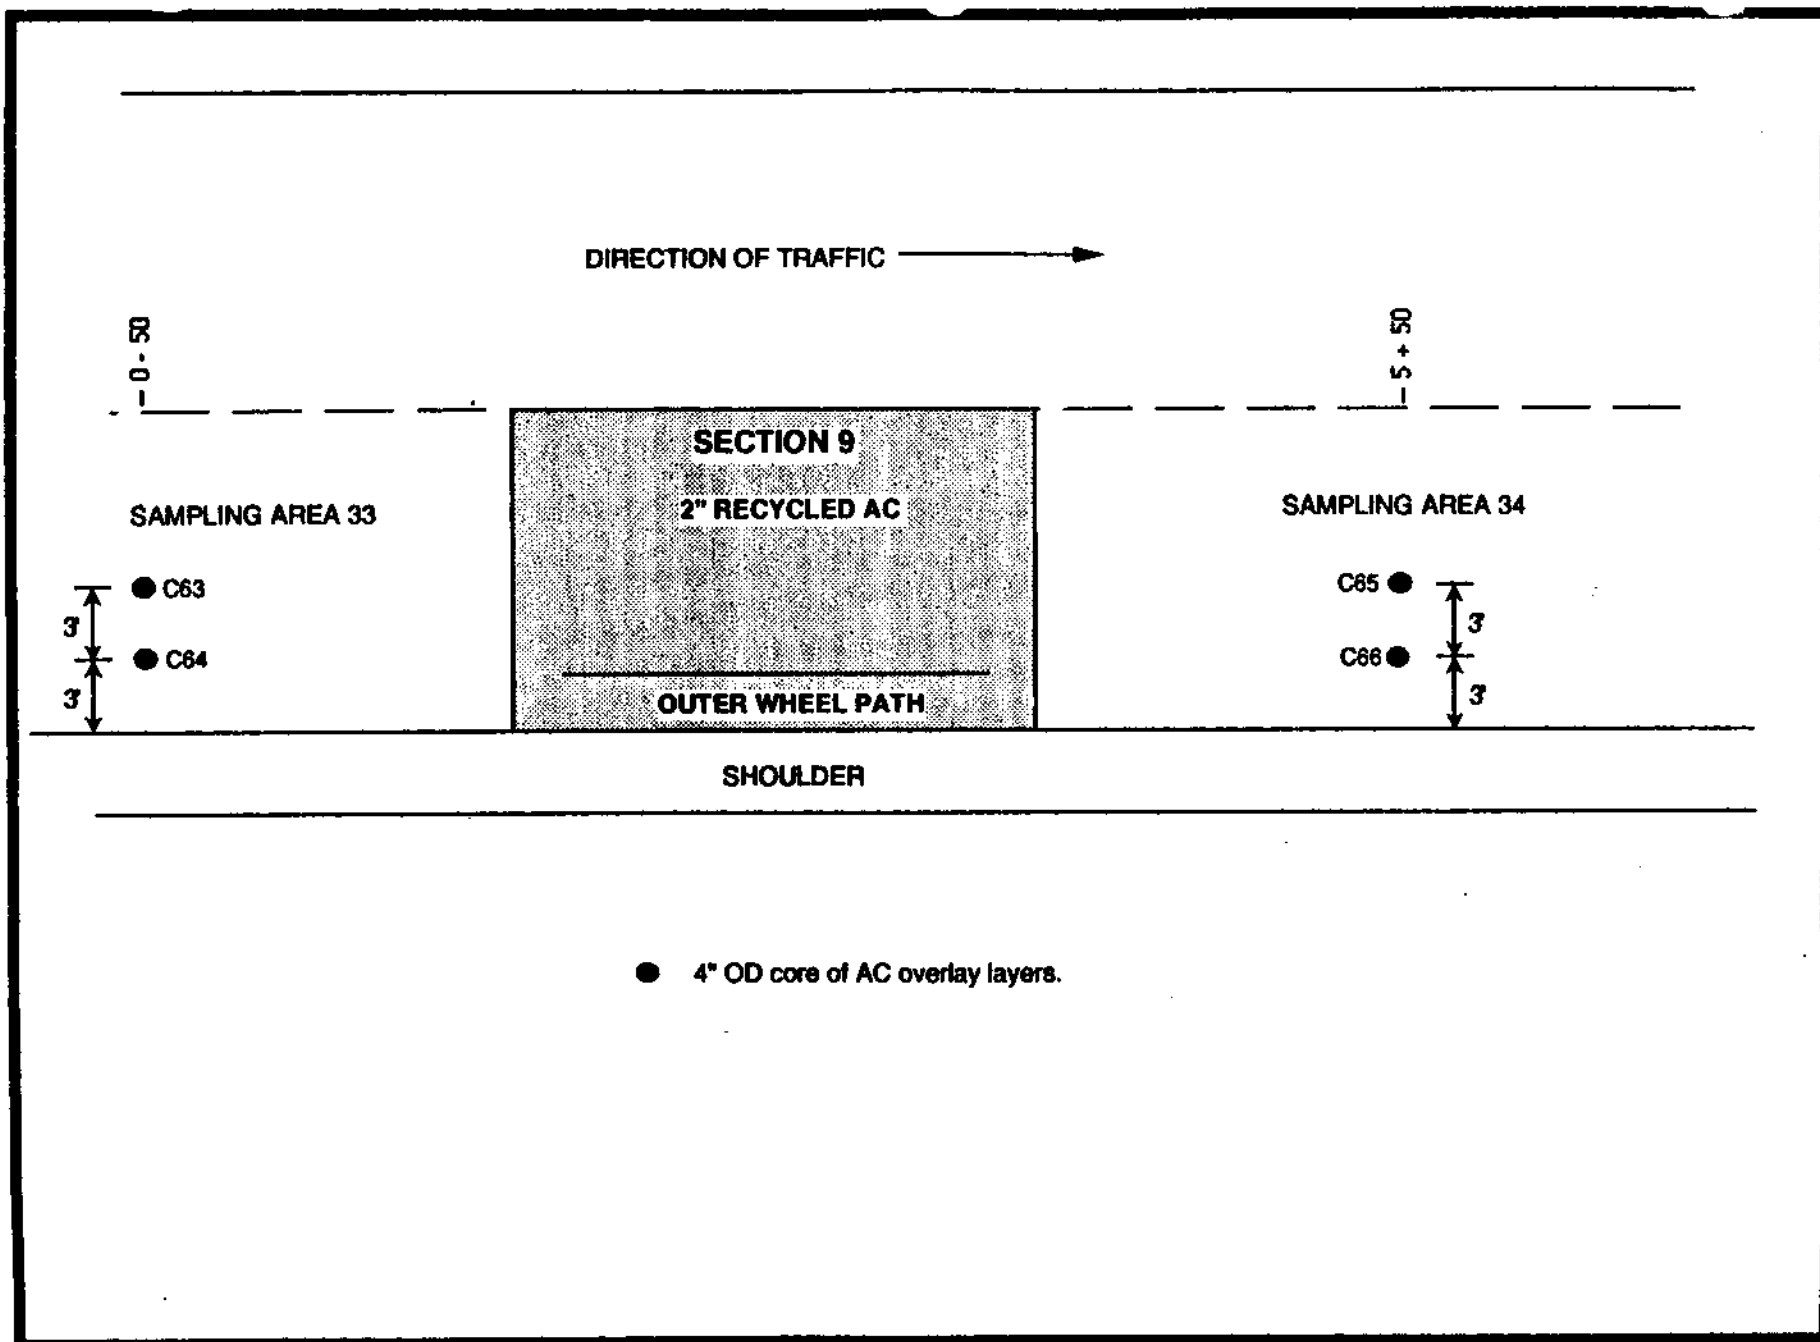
Example of "Post-Construction" Sampling Plan for Section 9.
